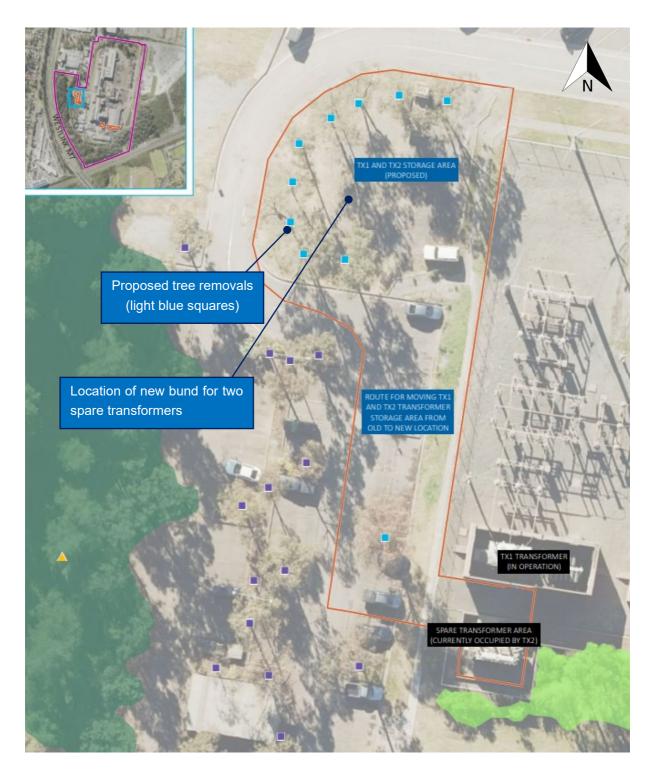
| Proposed Switchyard Transformer and Bund location and Tree Removal
